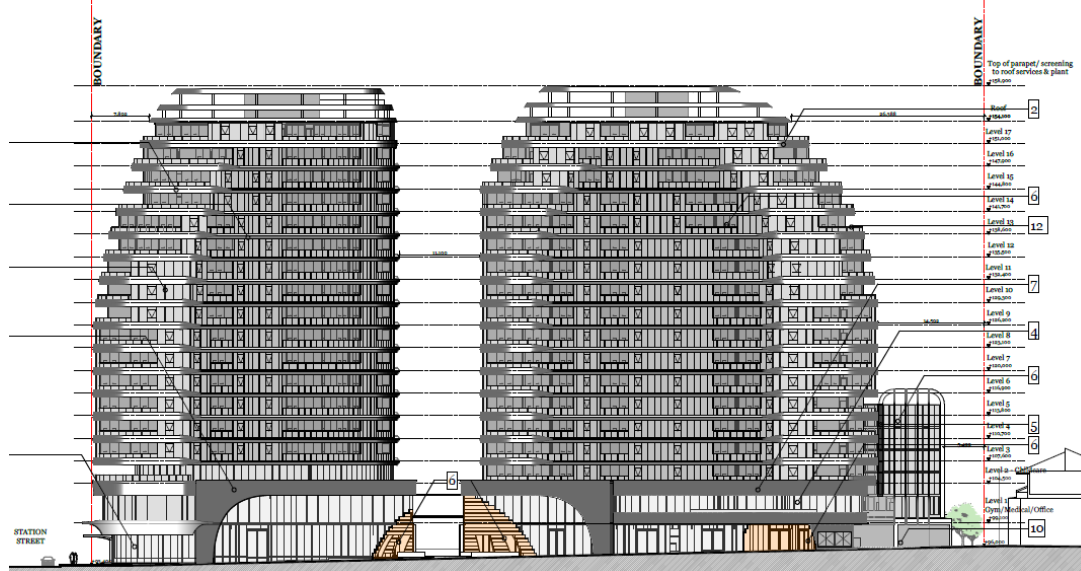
North elevation (Cambridge Street) showing the transition to the western boundary and Station Street
